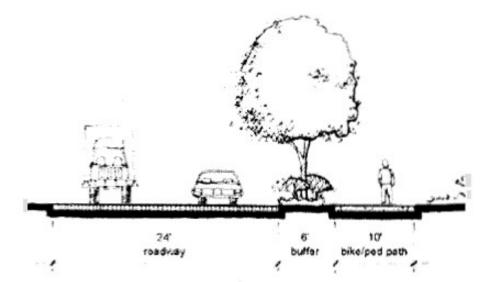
of City of Manzanita Downtown Transportation Plan, Classic Street Cross Section
